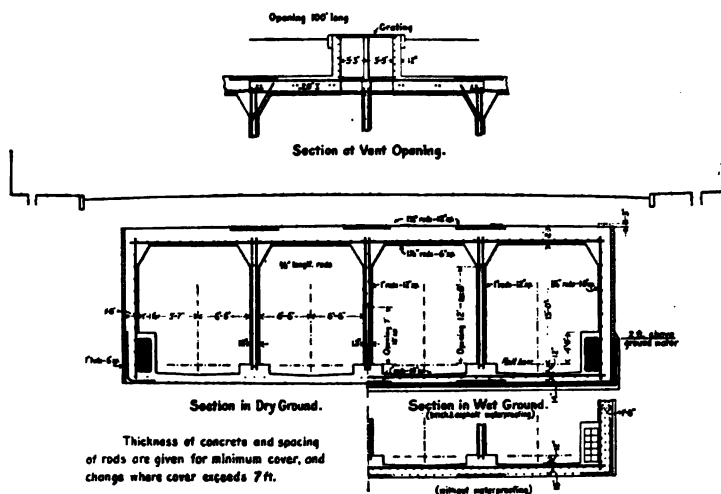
TYPICAL FOUR-TRACK SECTION OF SUBWAY.
